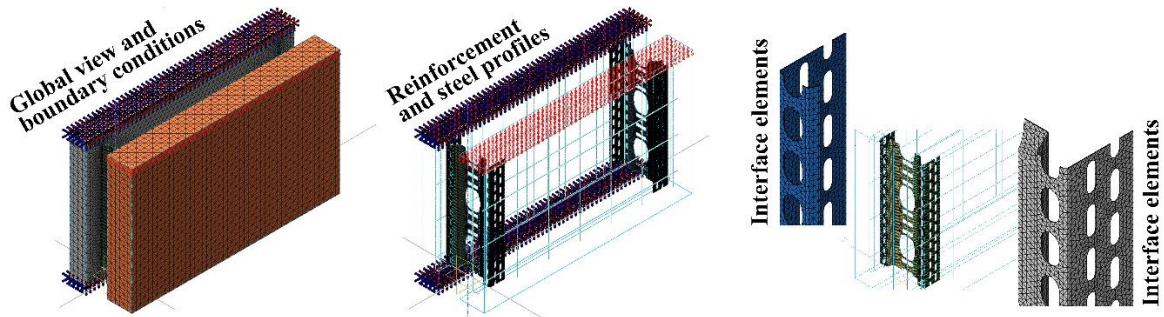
Example of FE model: global view and details – Specimen 600x1000 mm
